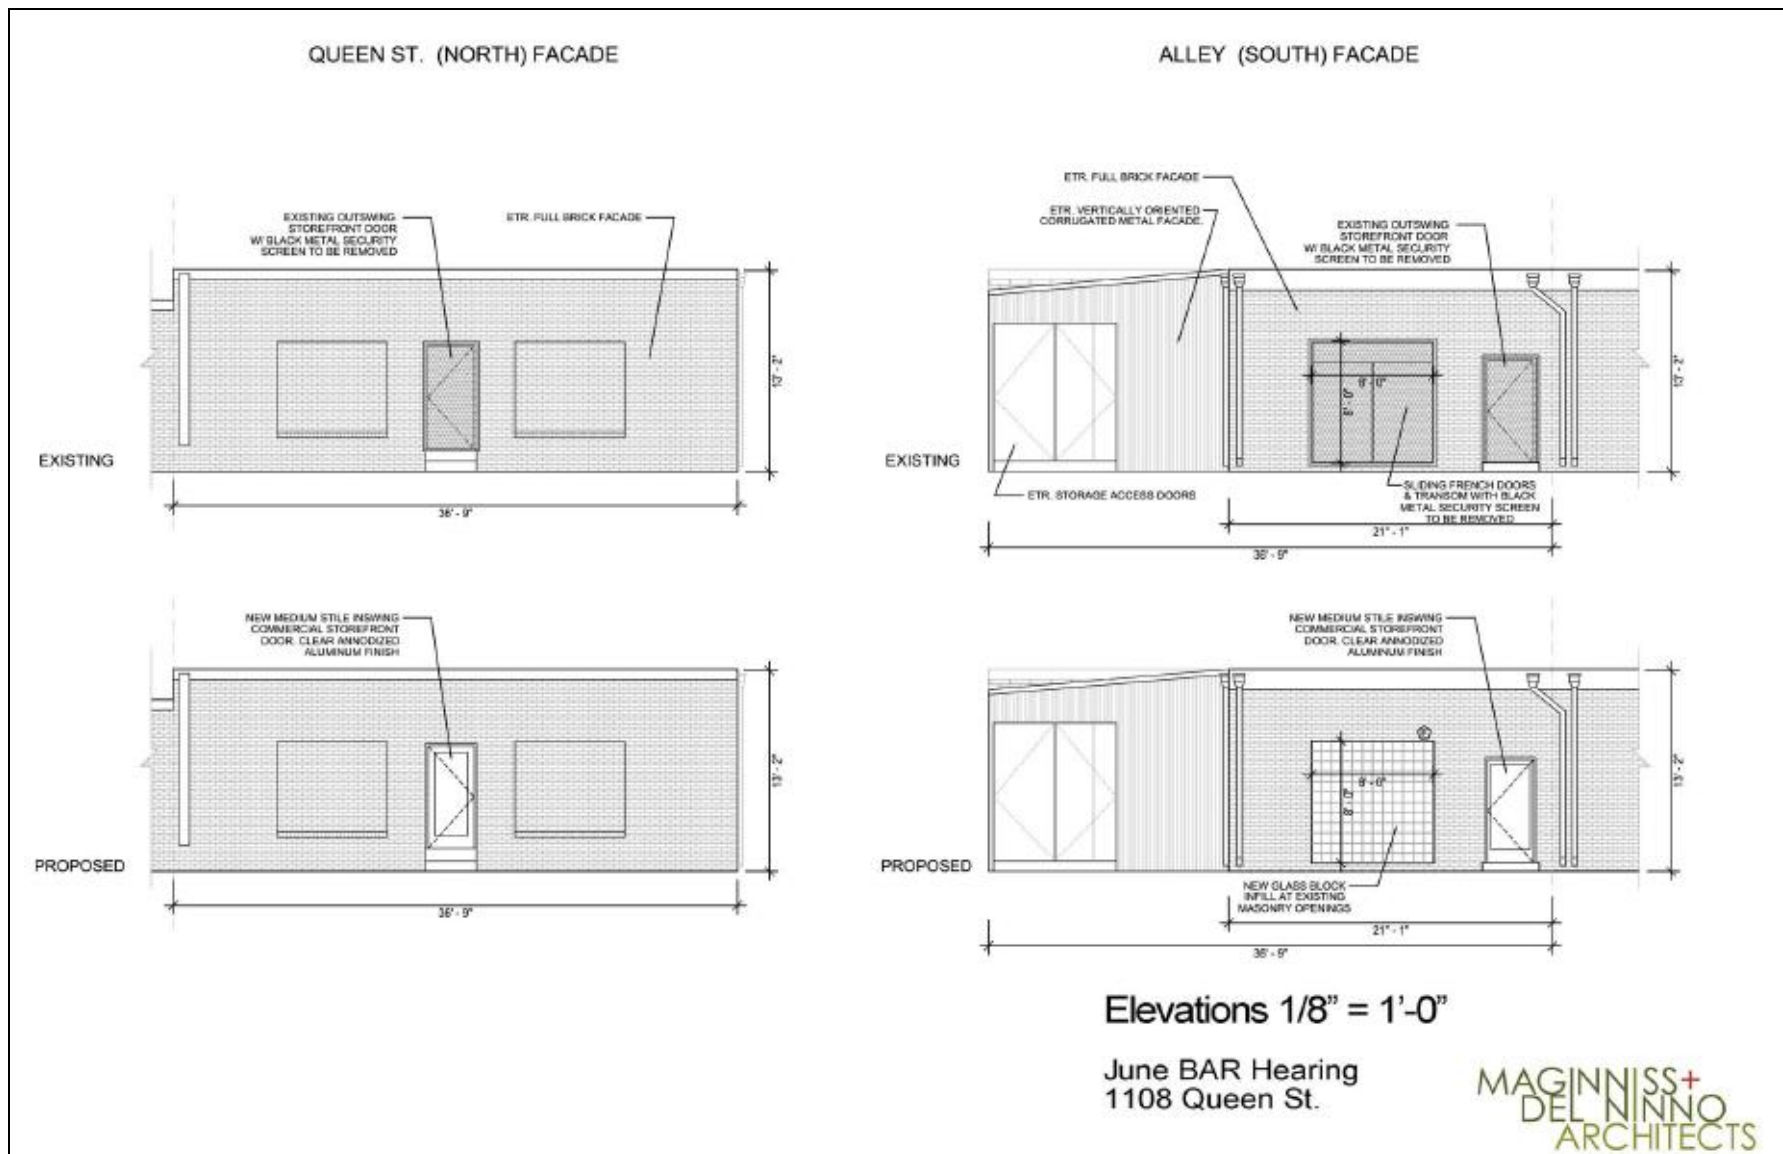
Existing and proposed front (north) and rear (south) elevations.
